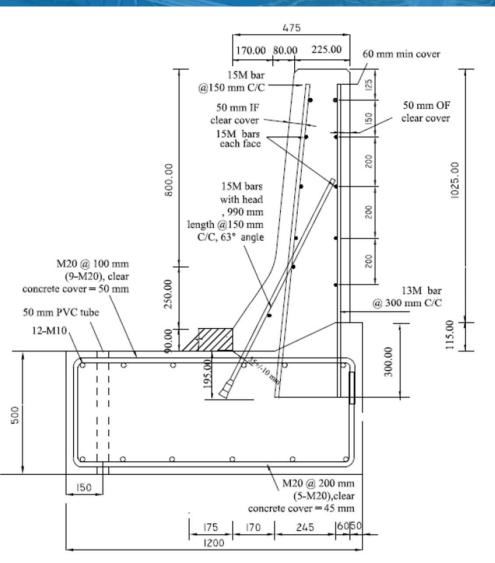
Barrier specimen B-2 details (Exterior Location - No Cantilever)
